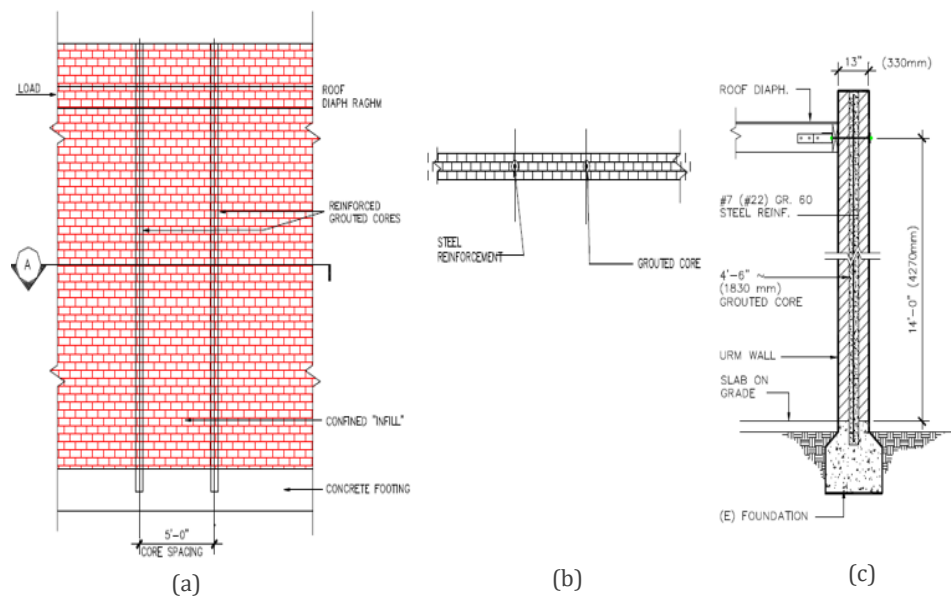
Center core detail. Elevation view (a), top view (b), cross-sectional view (c) (Breiholz, 1993)
